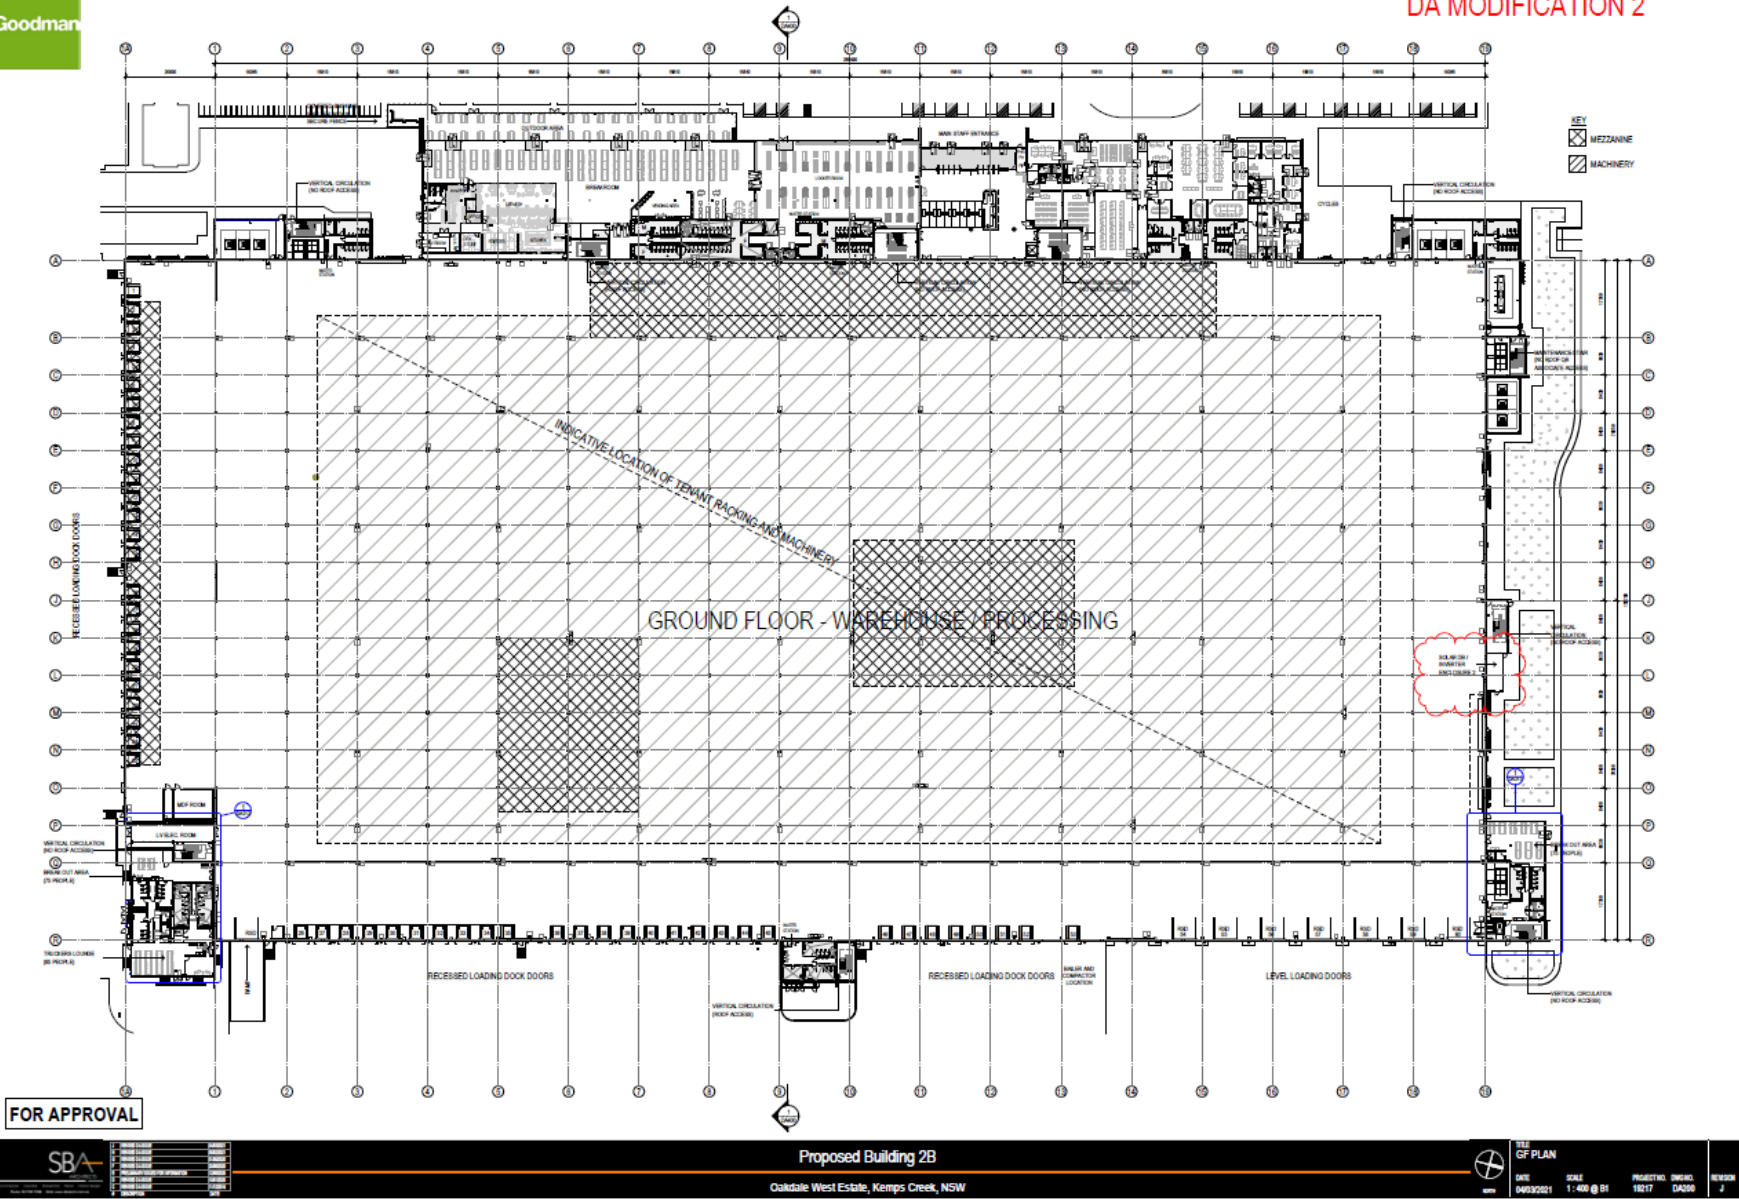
Typical Floor Plan (Mod 2 – Plan 2 of 4)
